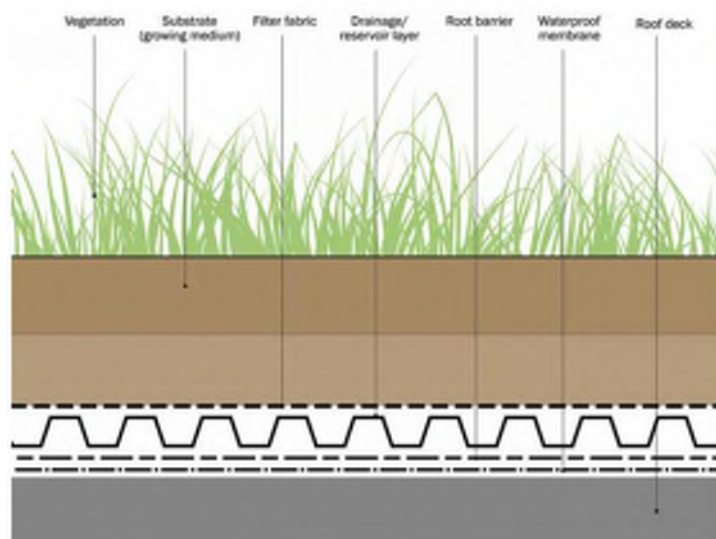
'SUDs Manual Figure 12.1 Section through a typical green roof'
